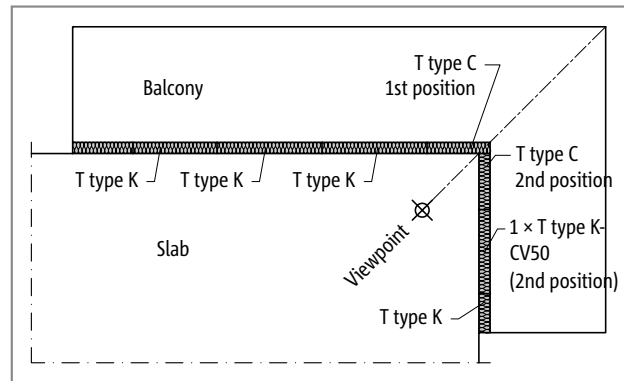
Schöck Isokorb® T type C: Balcony with outside corner freely cantilevered
